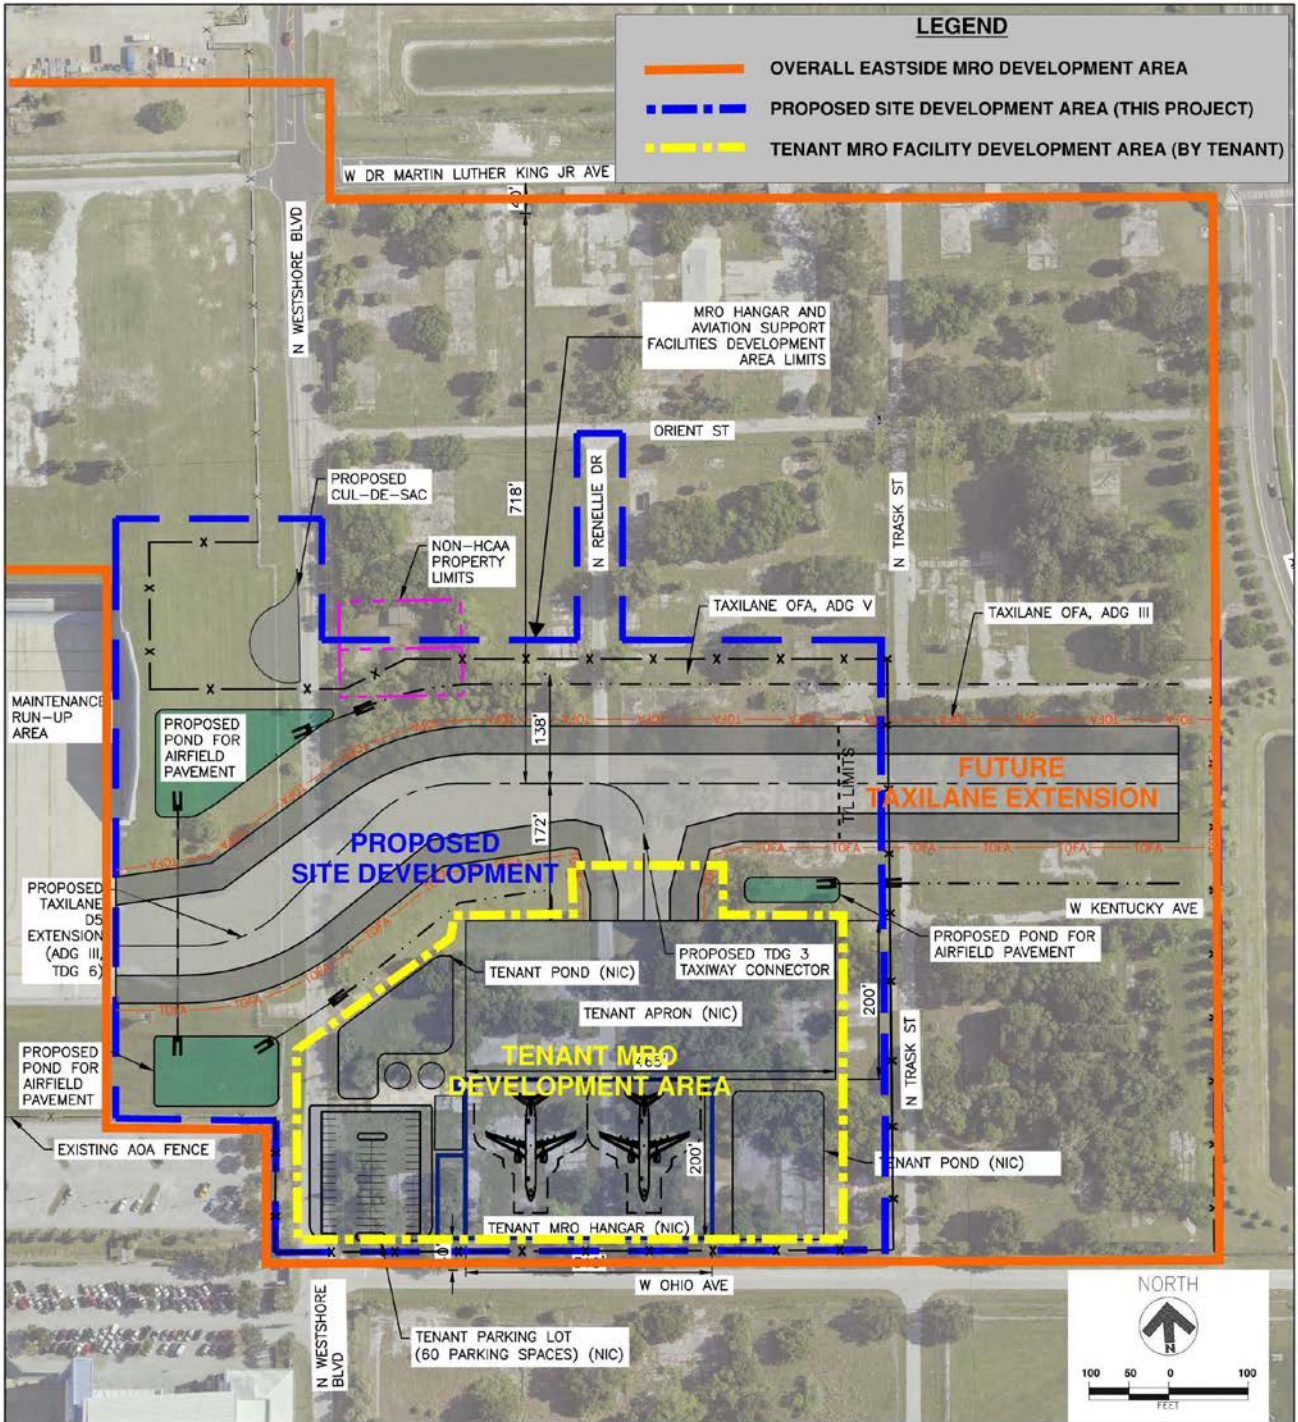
EXHIBIT B - CONCEPTUAL SITE LAYOUT PLAN
